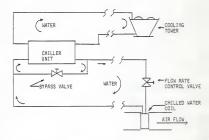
Chiller Unit--Chilled Water Coil--Cooling Tower system.
